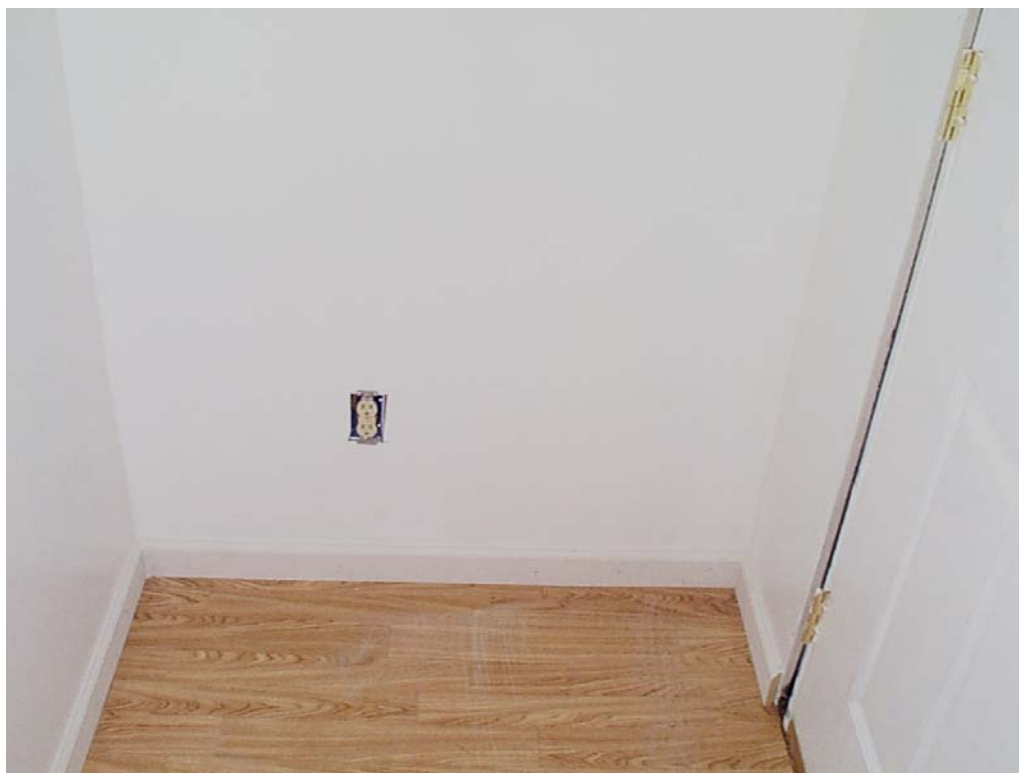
Module C-3 (Wall 2) Pre-flood. Walls and floor in new condition
